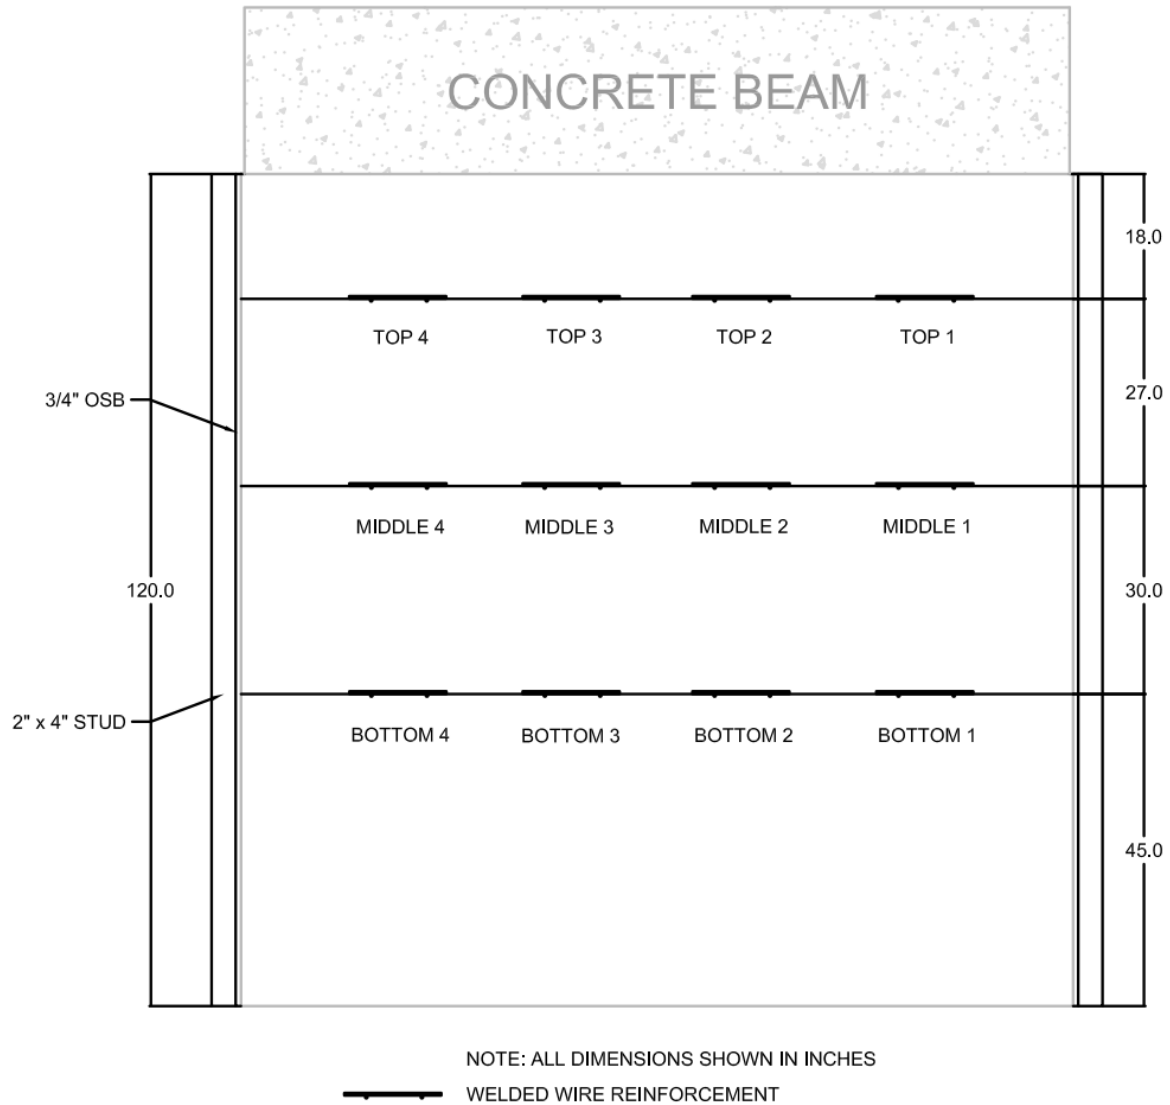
CAD drawing showing elevation view of pull-out reinforcement locations for Test 7.
